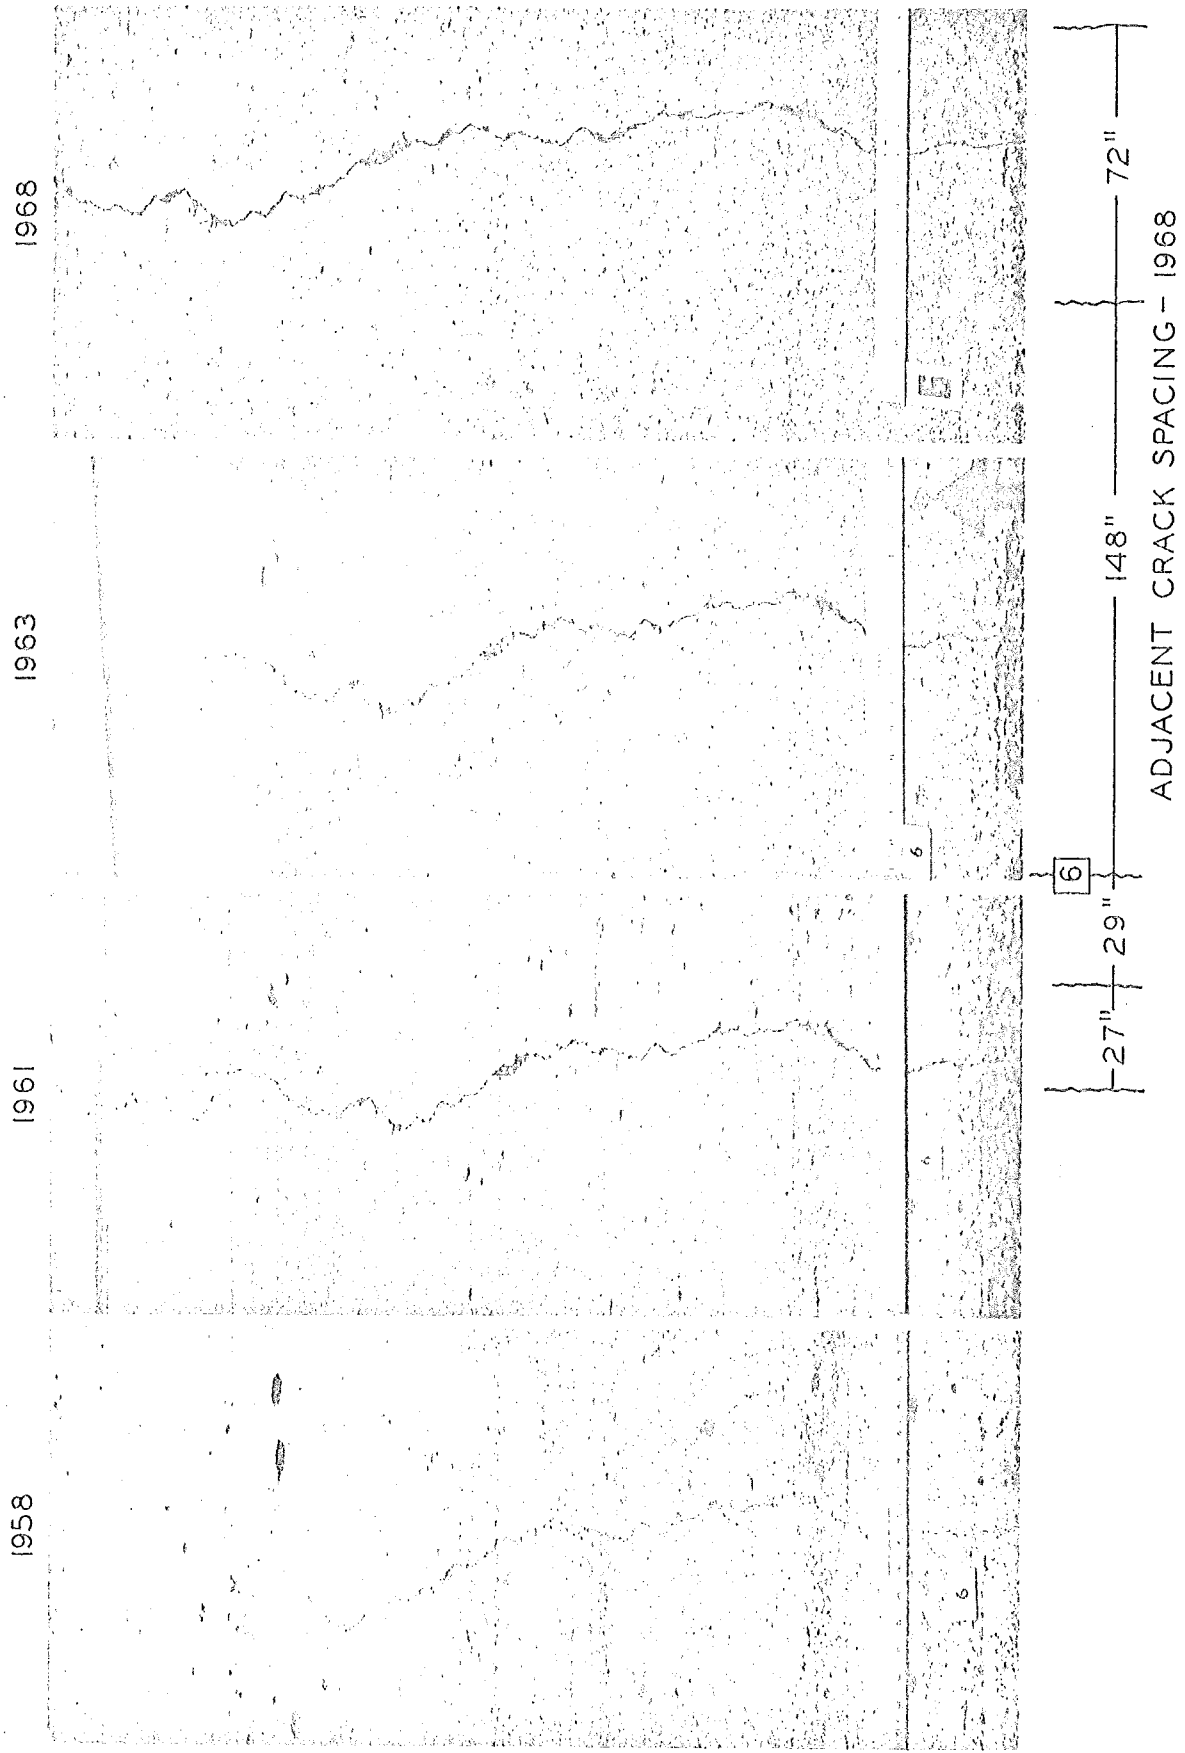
Transverse crack in bar mat section at construction joint.
